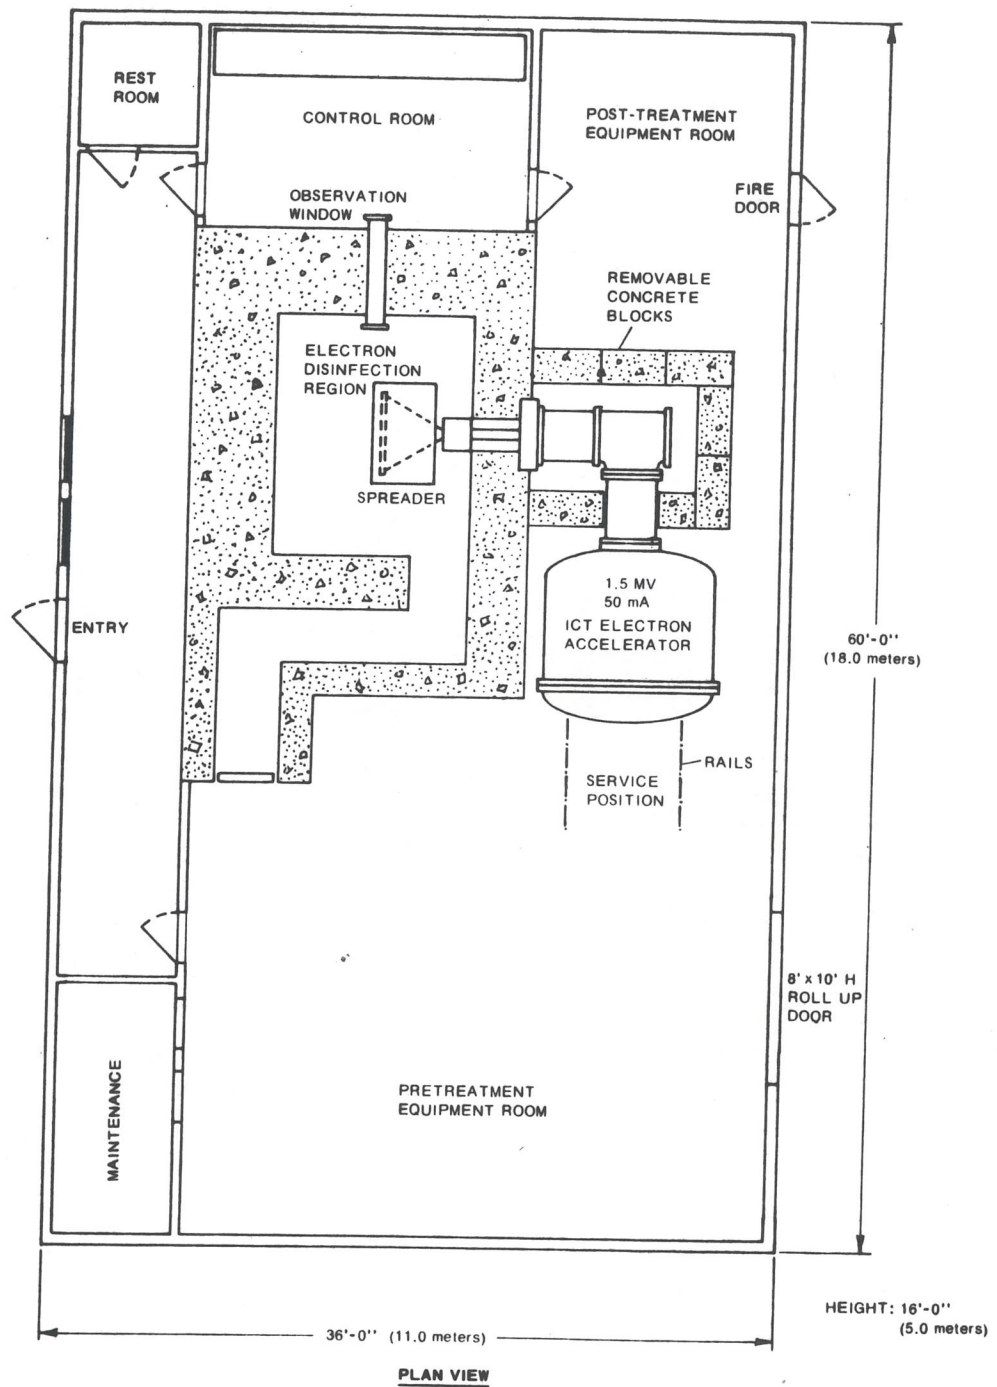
Typical Building Layout for Electron Disinfection of Wastewater/Sludge
